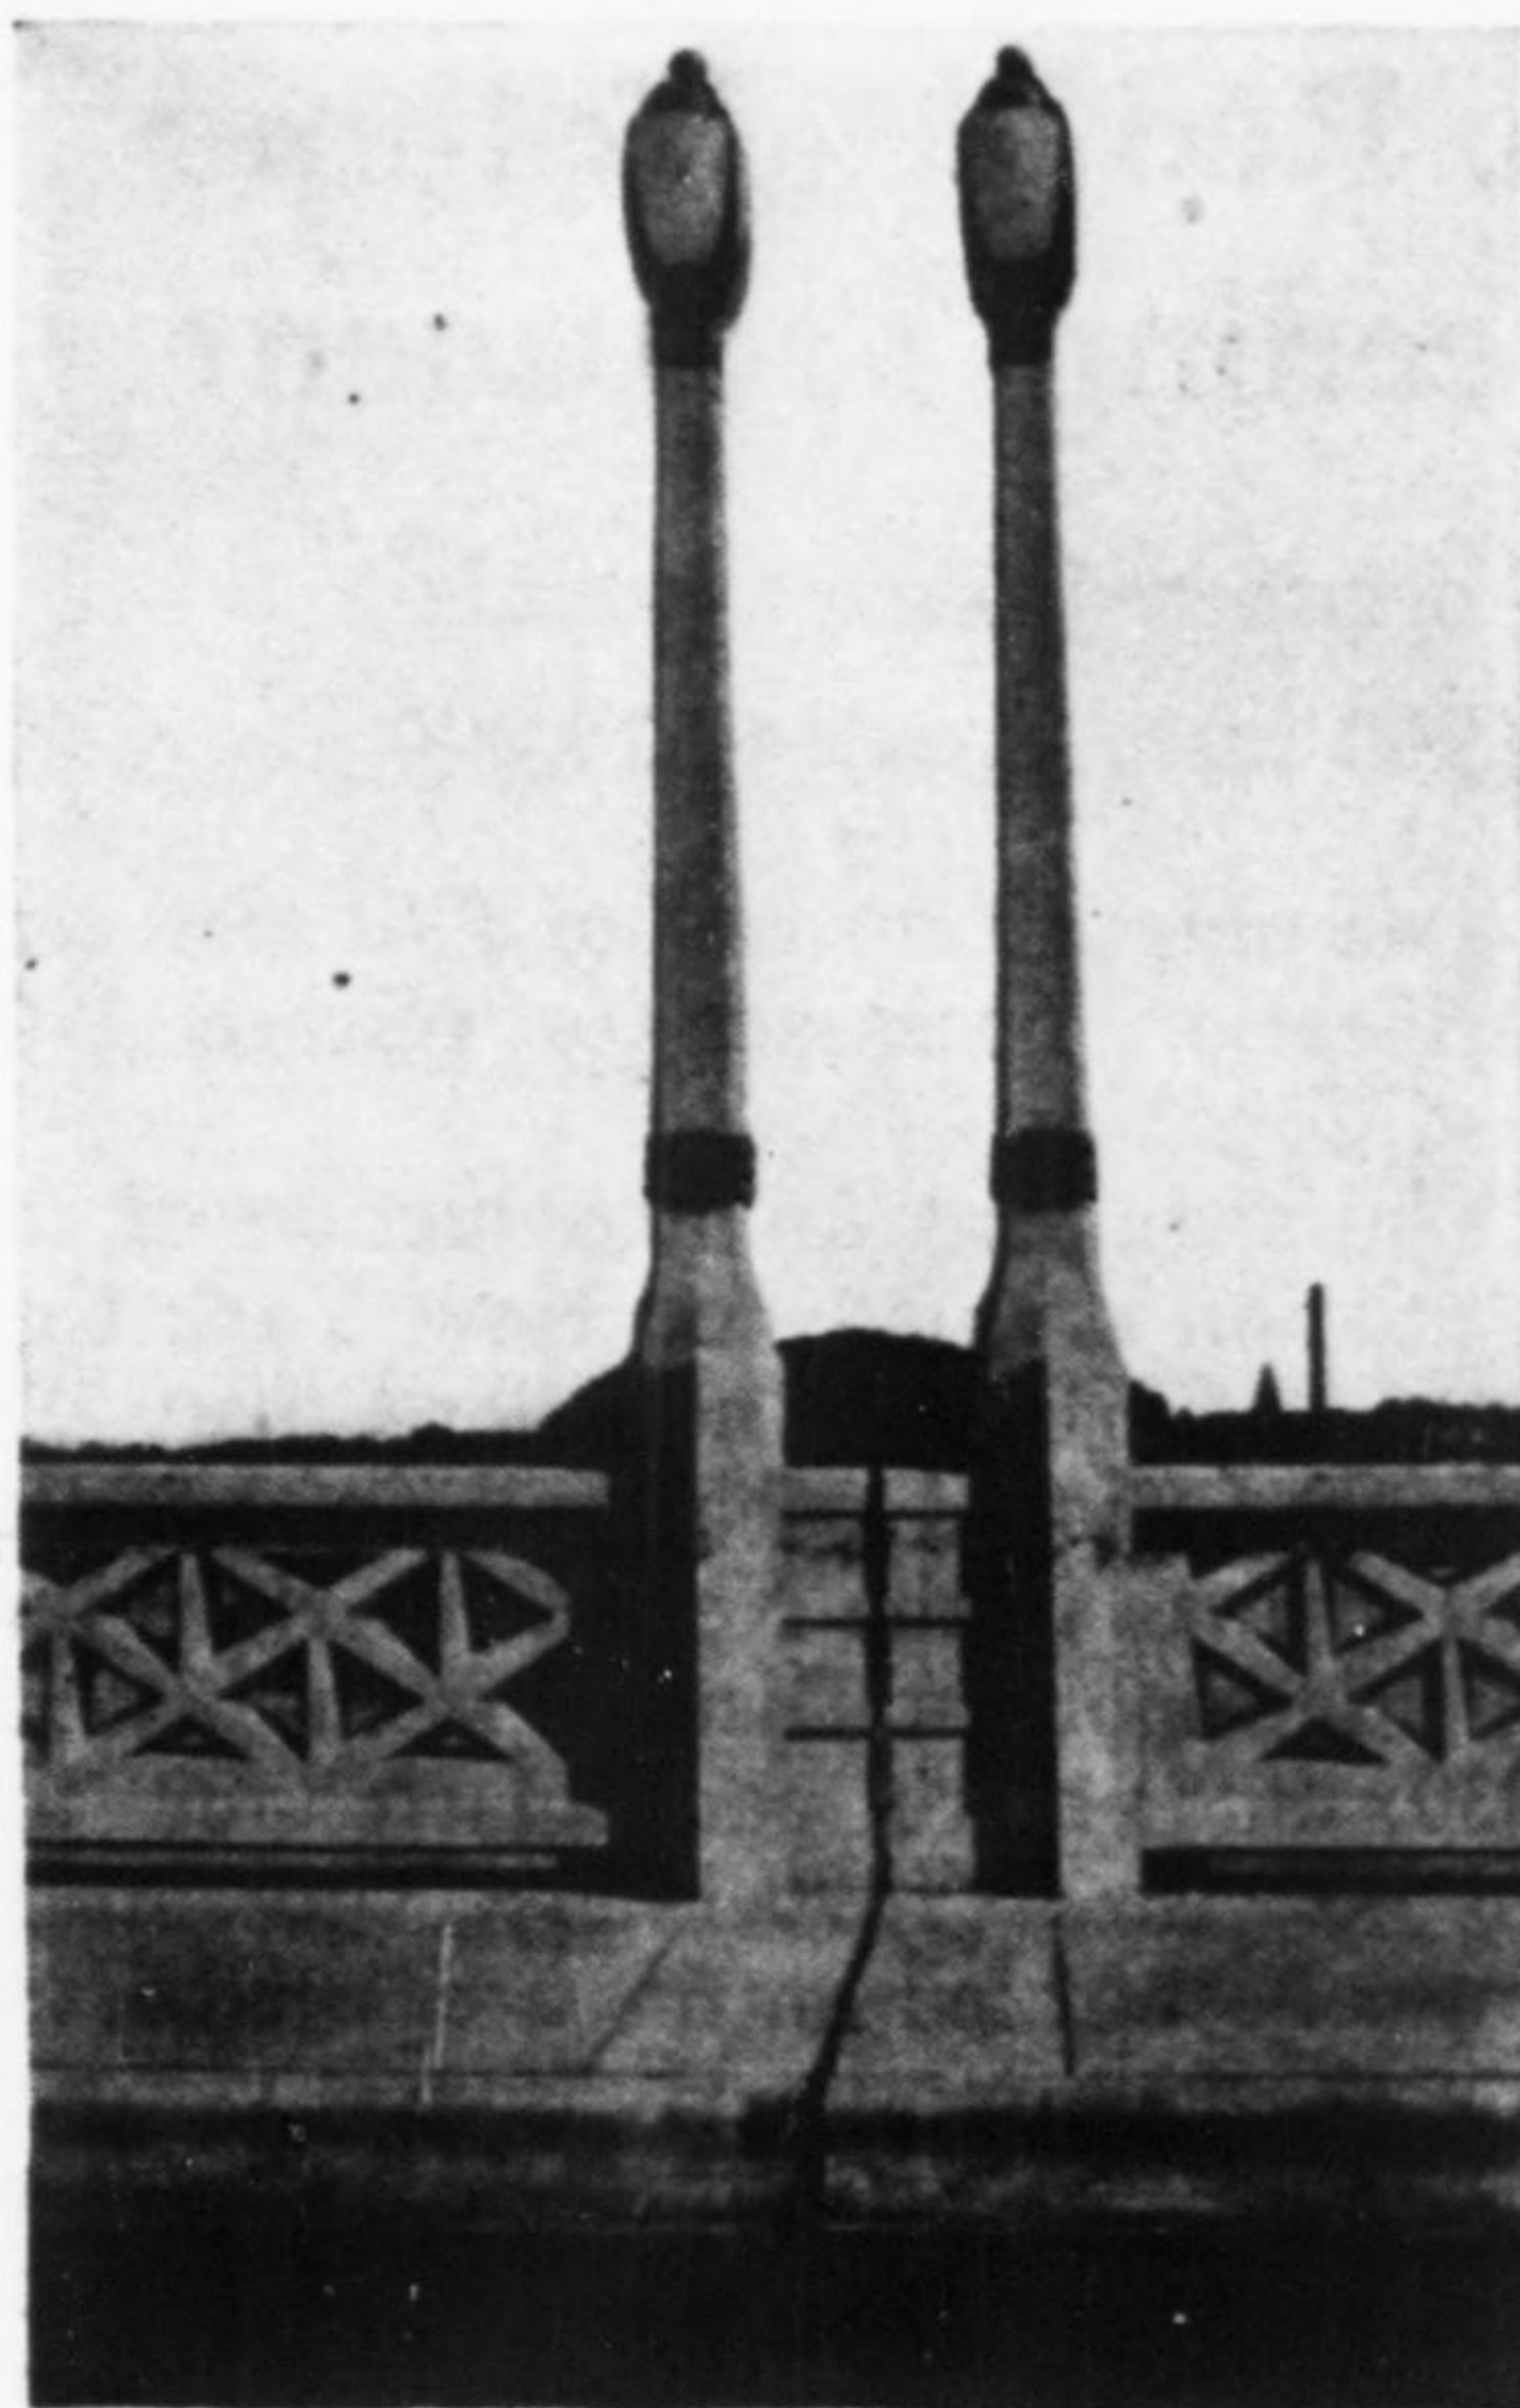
Lamp standards and parapet. Expansion joint is open in parapet, filled in the sidewalk and covered by bituminous paving in the roadway.
